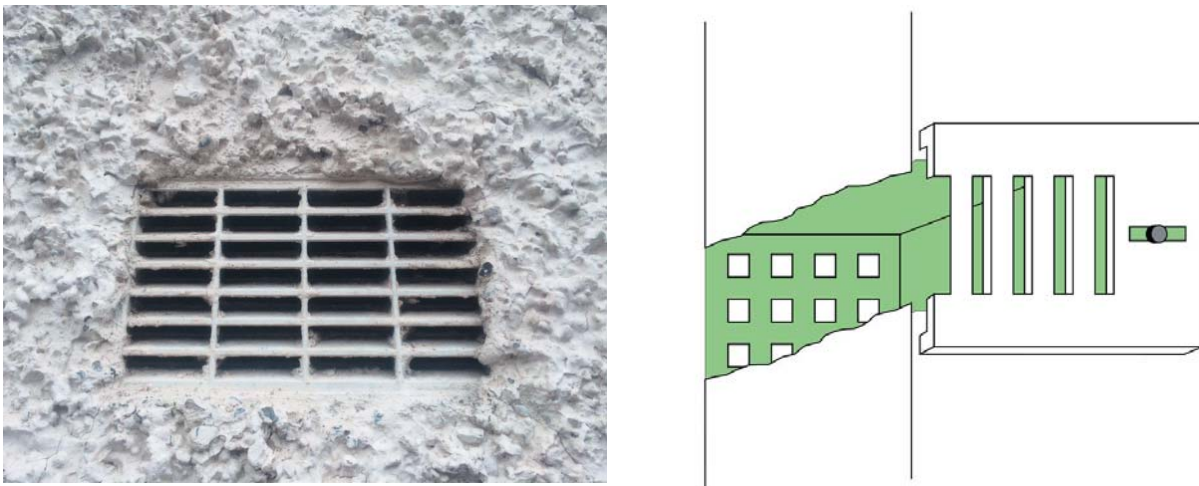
External view of throughwall vent perforating the envelope (left) background ventilator as a through-wall vent in UK Part F documents [4].
